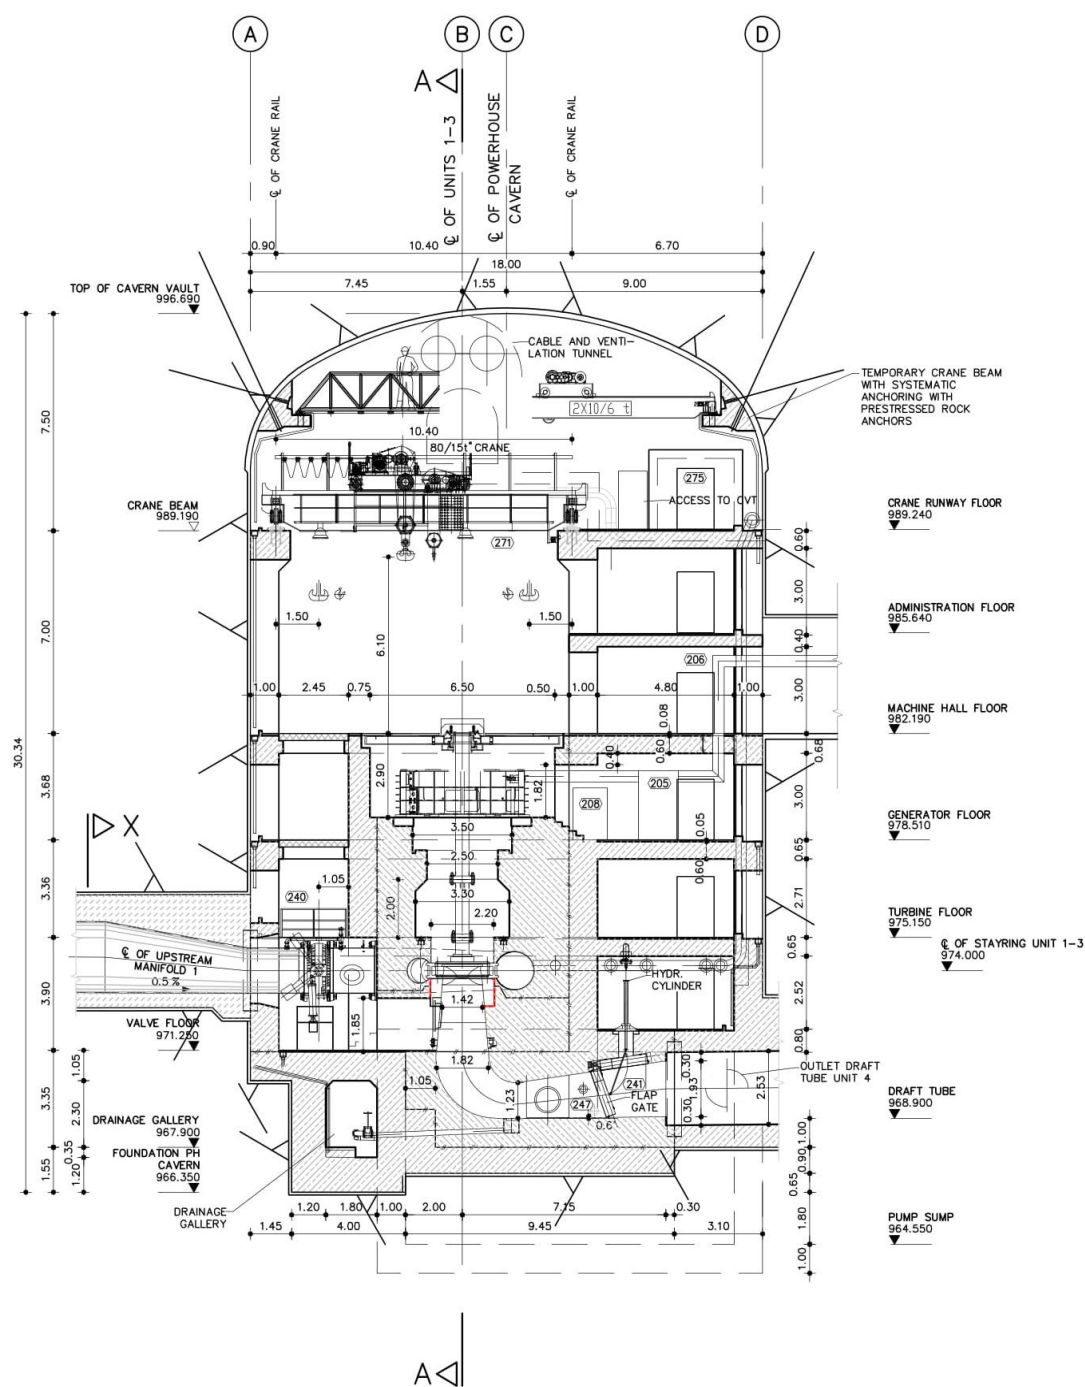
Section of Powerhouse through Centerline of Unit 1
